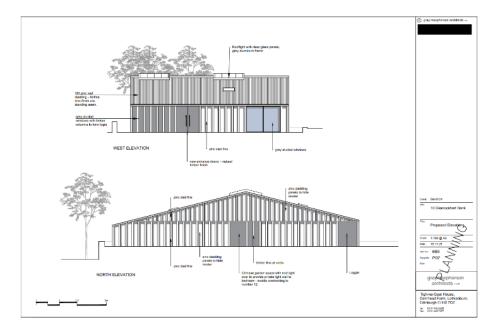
Proposed West (facing No 10) and North Elevation (facing No 12)
